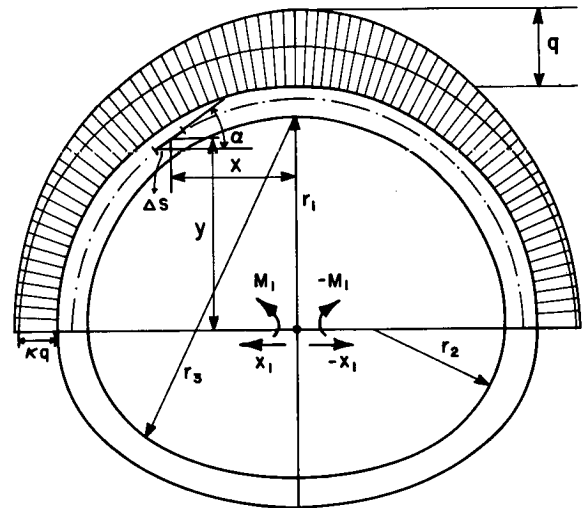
Assumed load distribution on an egg-shaped culvert.
